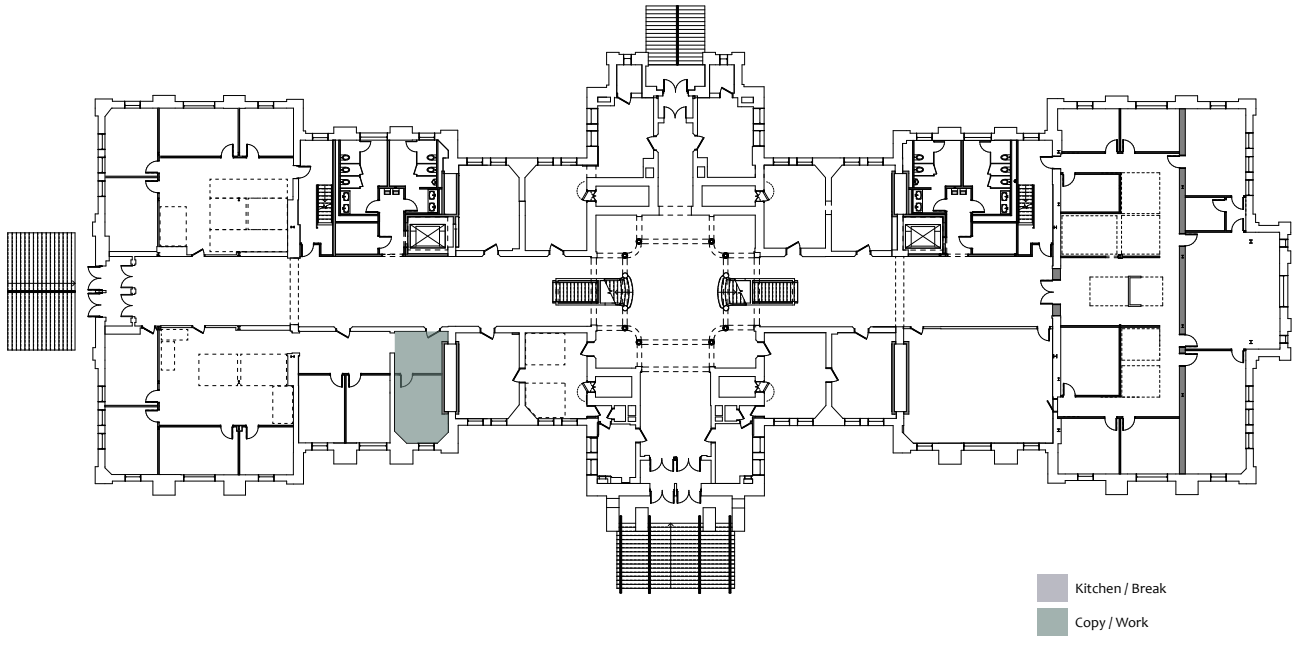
Proposed Kitchen/Break and Copy/Work Rooms - First Floor [Capitol]
